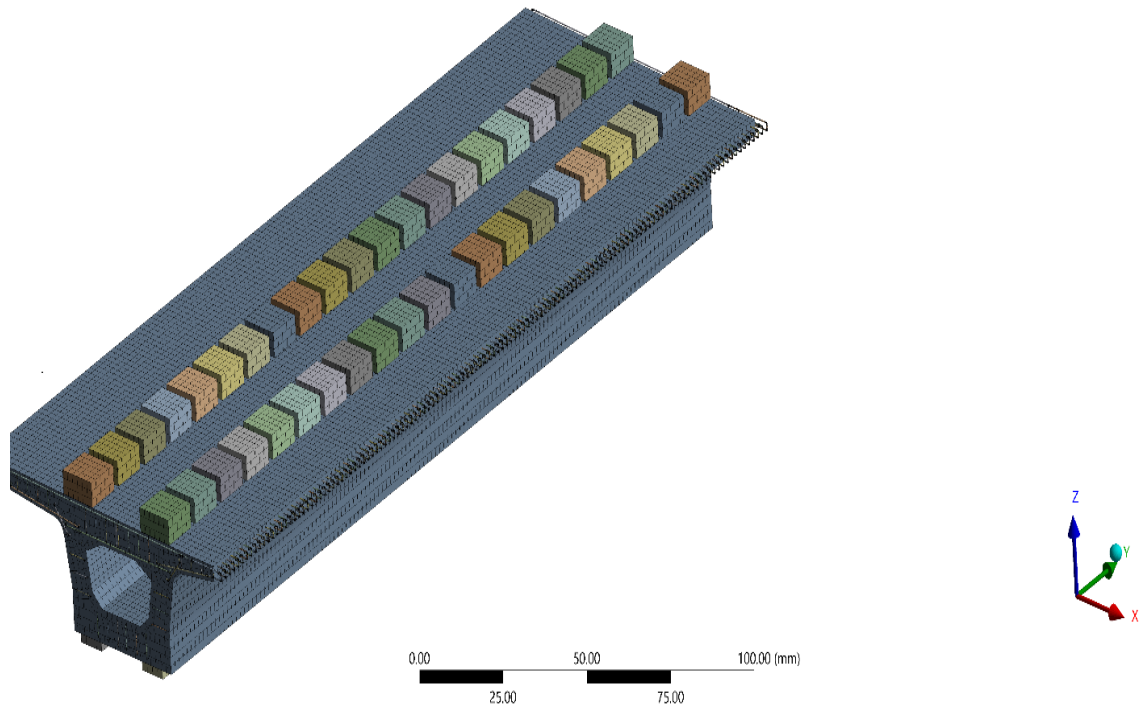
Mesh Size of Prestressed Concrete Box Girder Railway Bridge
